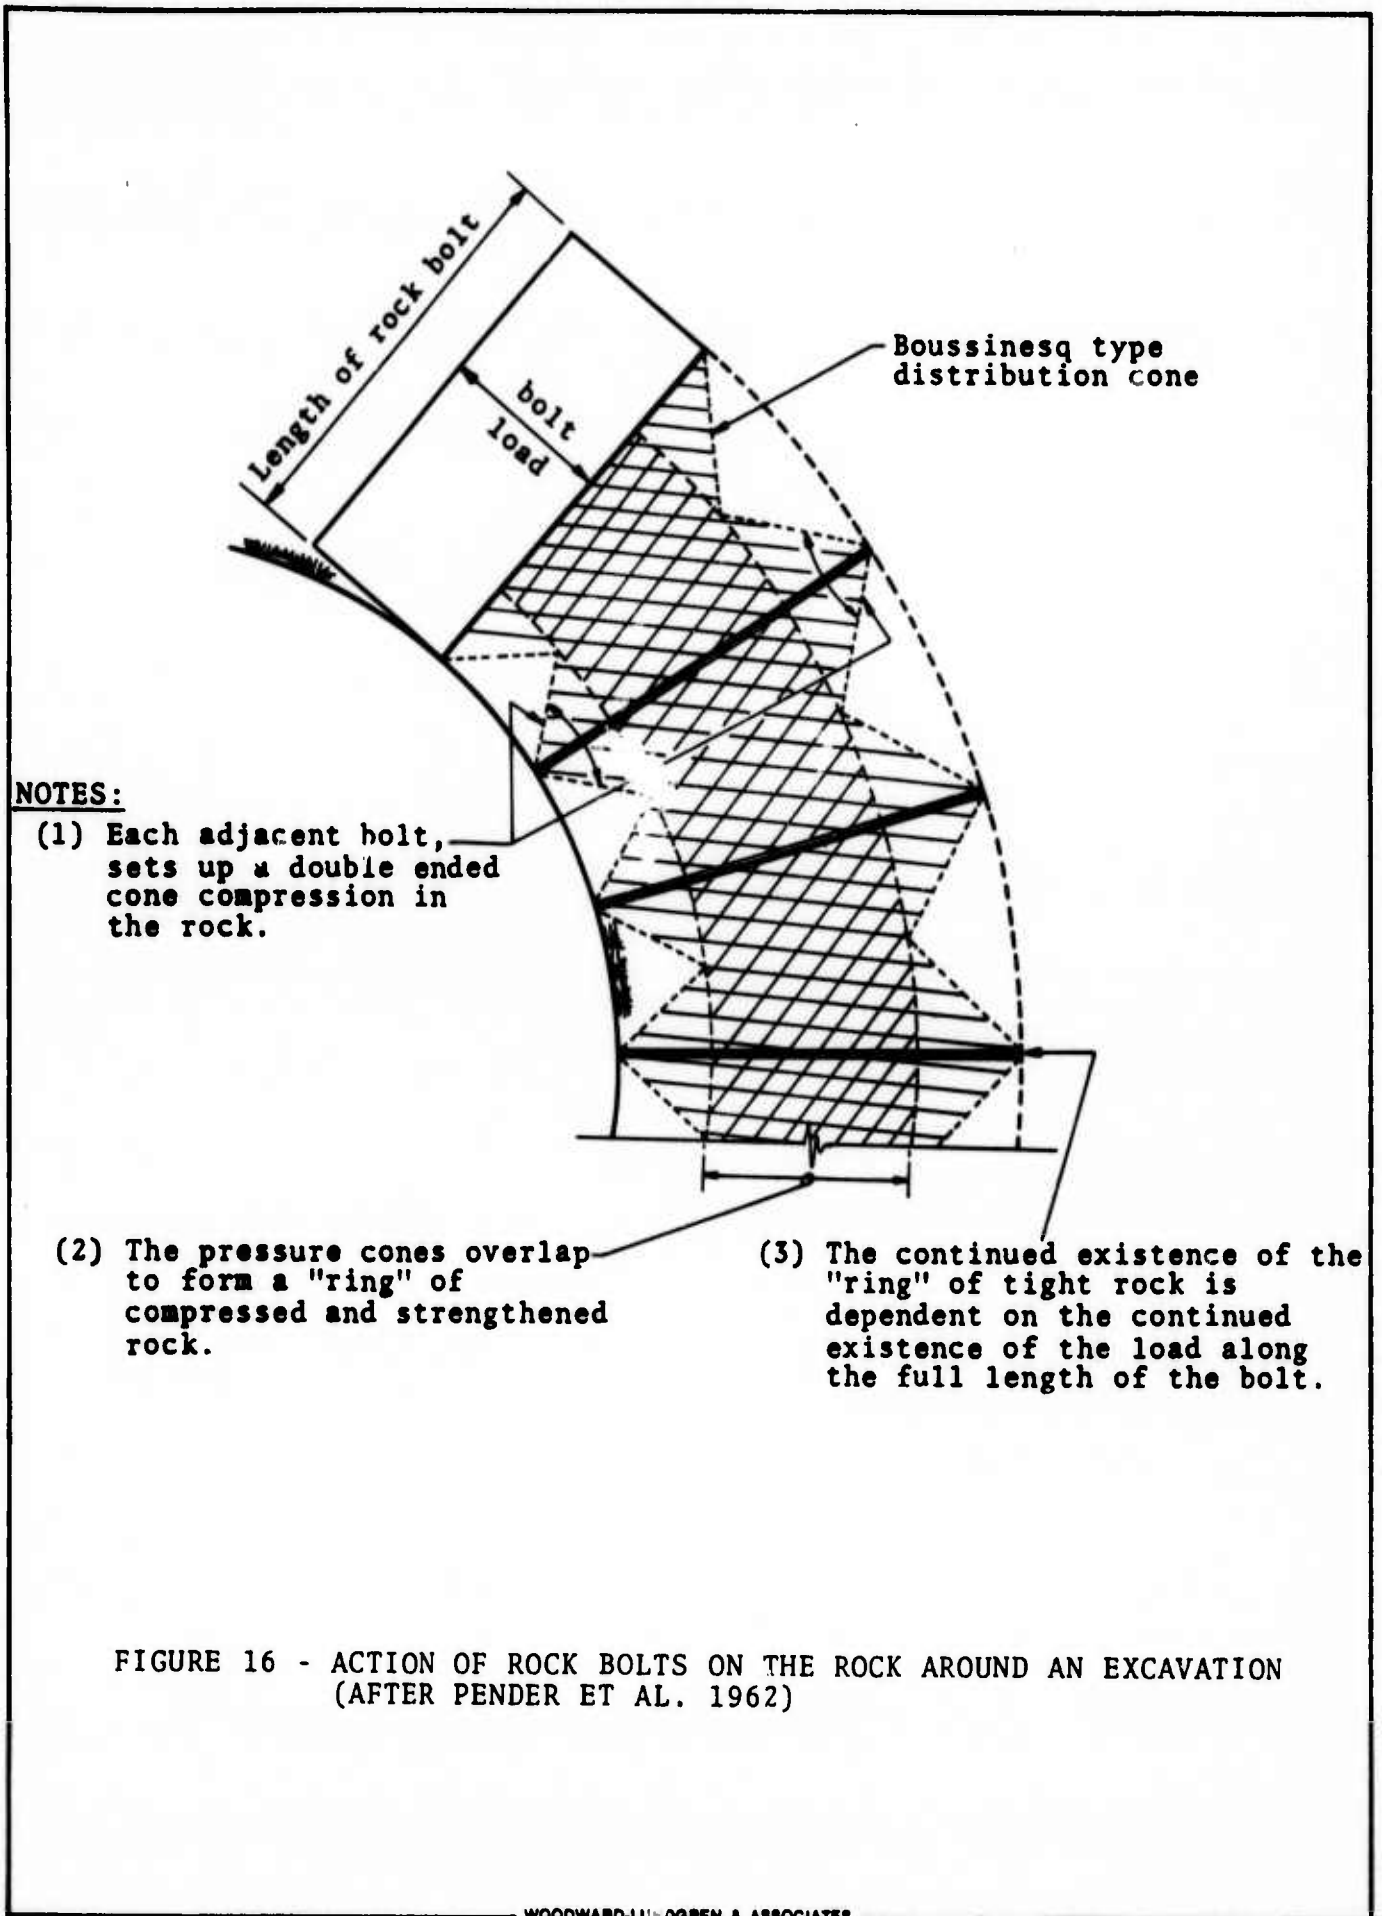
ACTION OF ROCK BOLTS ON THE ROCK AROUND AN EXCAVATION
